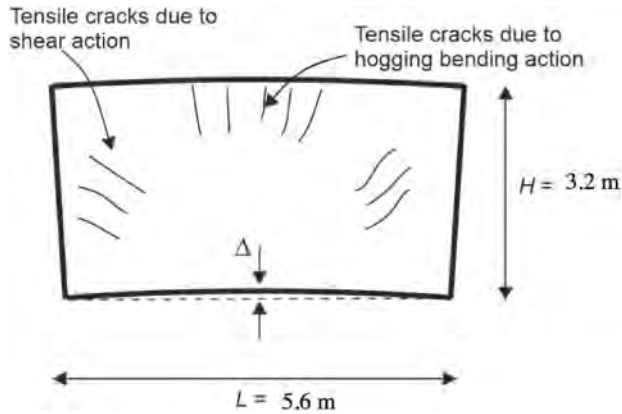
Assumed deformation mode and potential crack locations for elastic deep beam approximation of the building façade.
